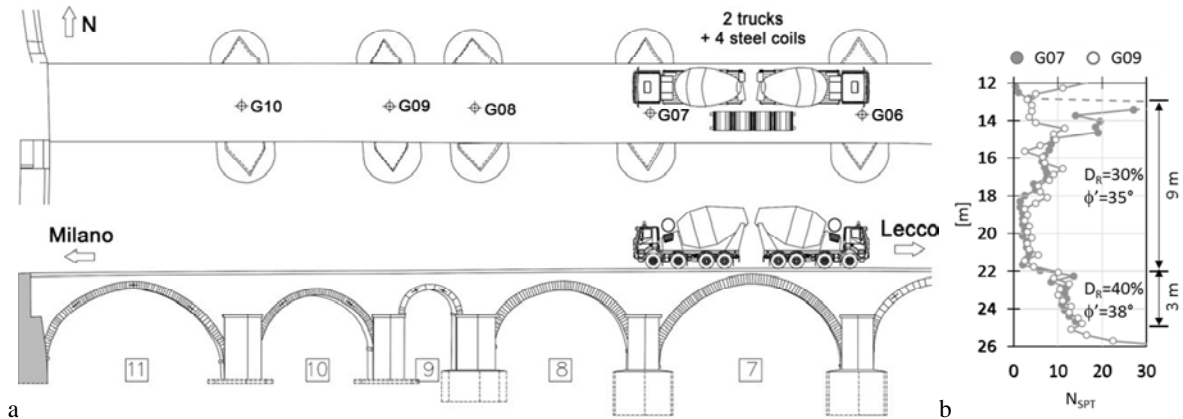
(a) Plan and front views of the bridge: vertical cores and loading scheme; (b) SCPT-DPSH profiles and preliminary characterization.
